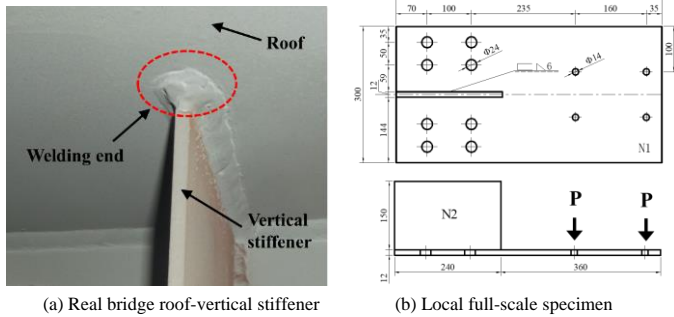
Local full-scale specimen of roof-vertical stiffener
